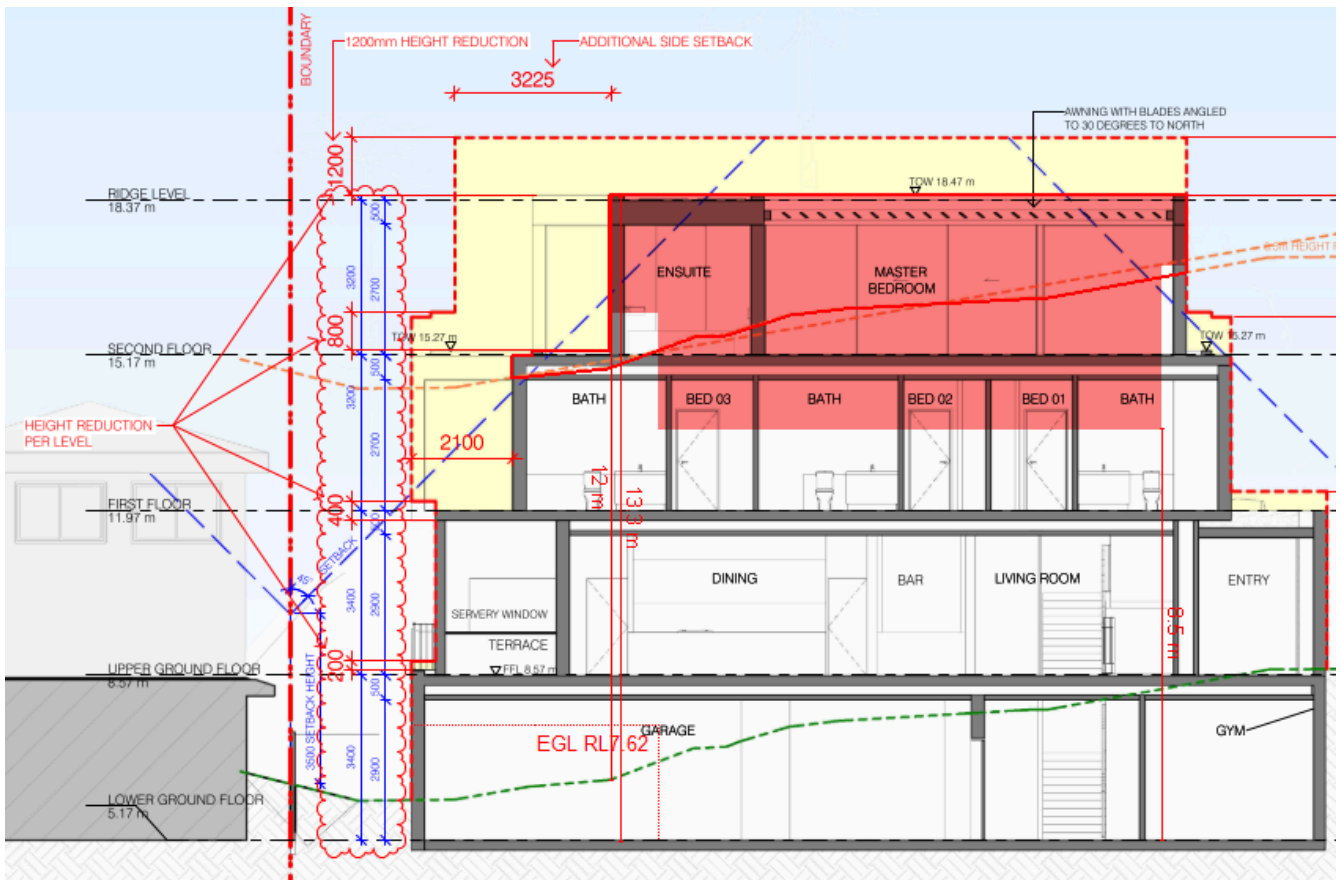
Section 04 extract with building height variation shaded red (existing ground levels) and outlined in red (Applicant's assumed natural ground levels)
